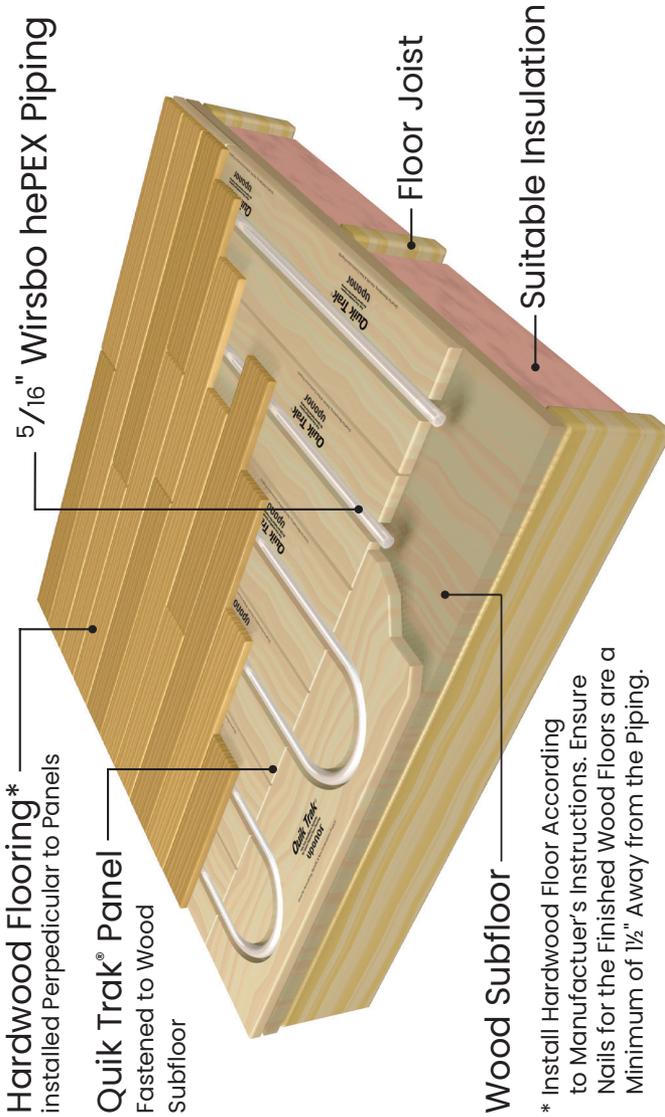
Quik Trak over a wood subfloor with hardwood floor covering
